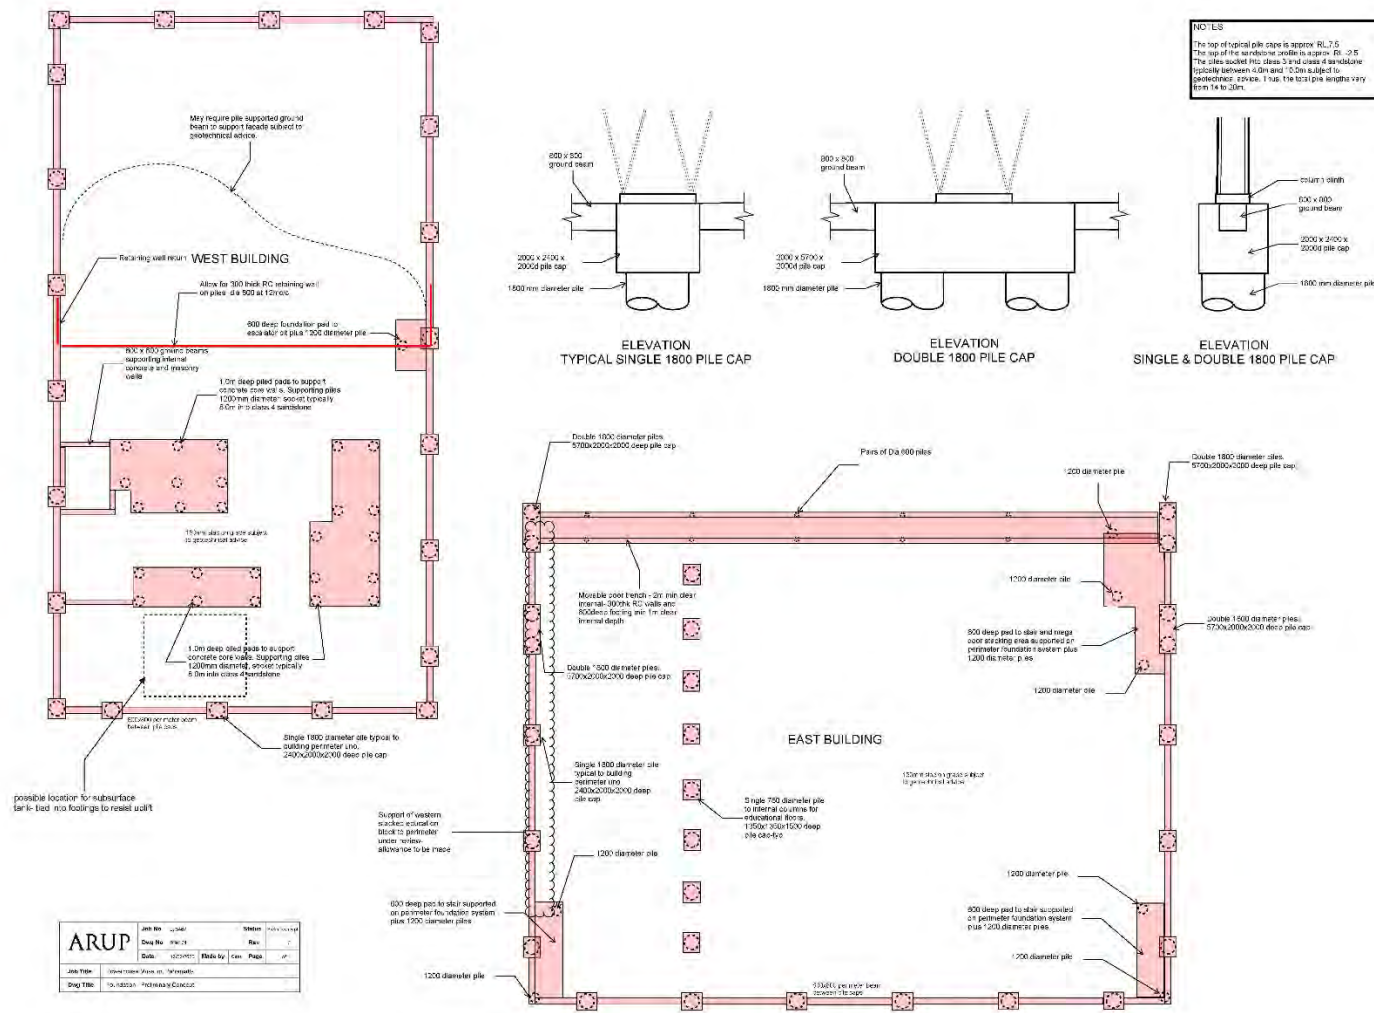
Foundation-Preliminary Concept (Arup, SSK-01, 12.2.2020)
